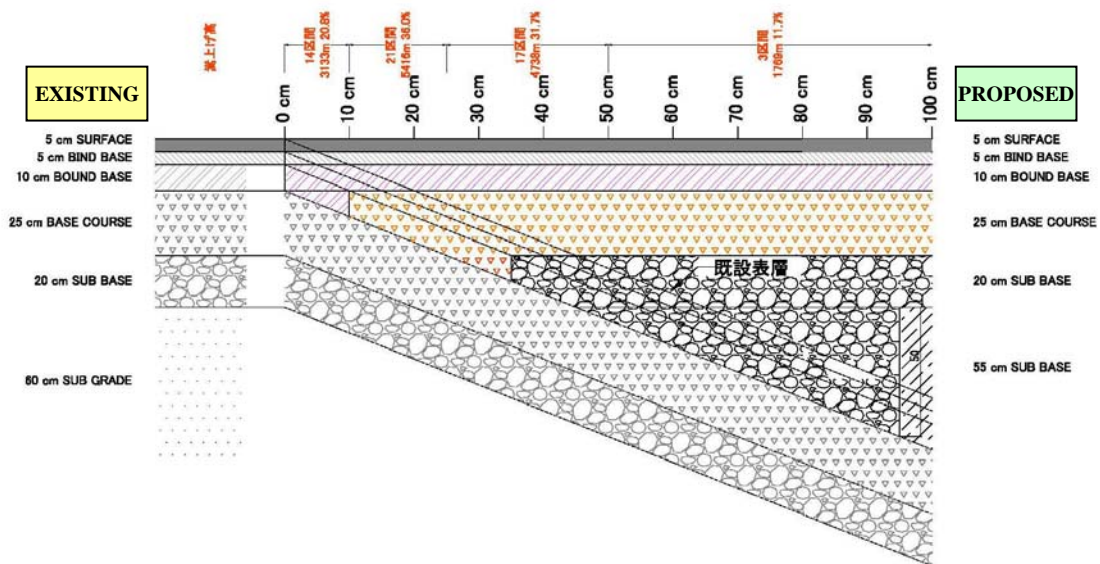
Types of Pavement Structure of the Sections to be Raised (1)
